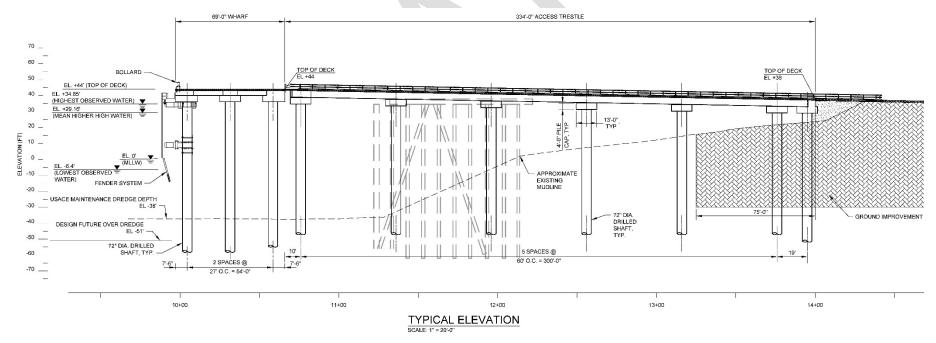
Longitudinal Elevation for T2 Access Trestles: Alternative 2B with 72-inch-diameter Drilled Shafts
